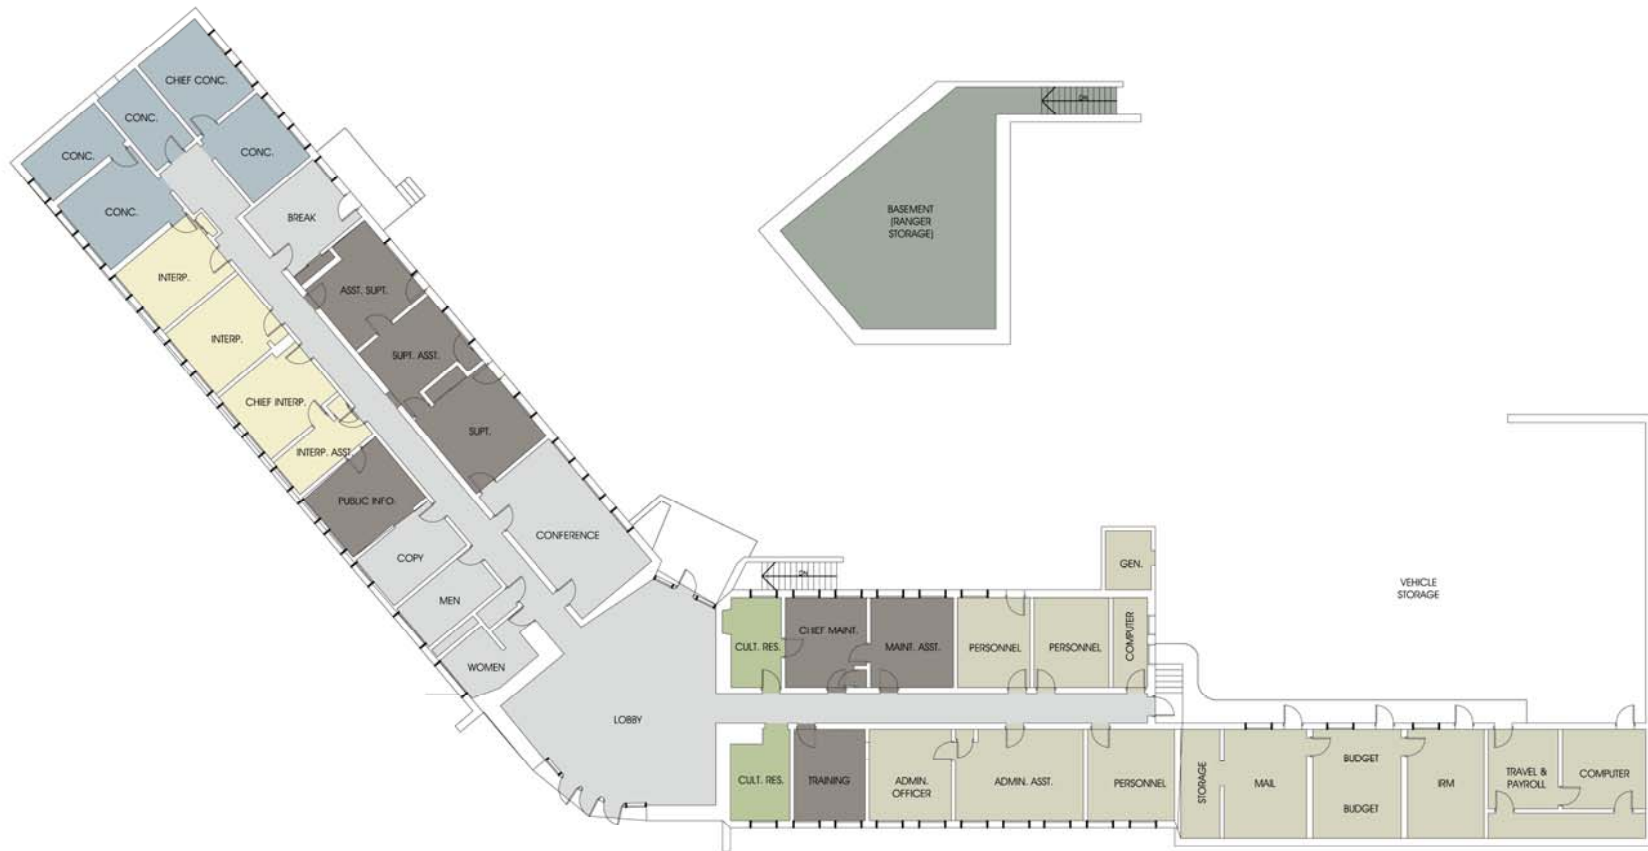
Existing layout of Headquarters building (*courtesy of ajc architects, 2007*).
